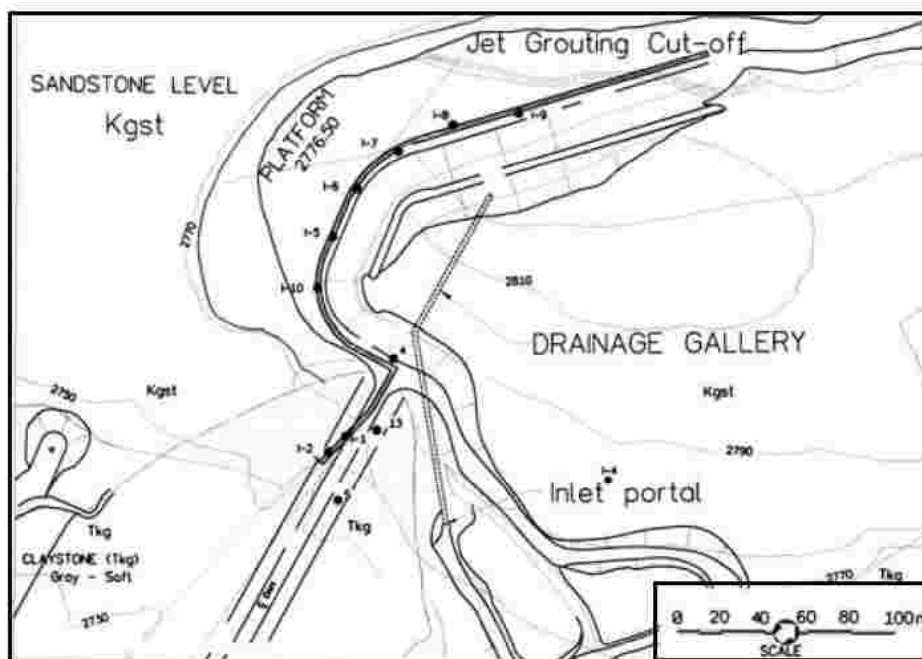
Left abutment: Jet grout curtain and drainage gallery with piezometer stations
